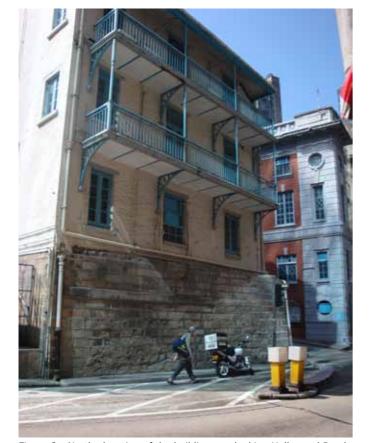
North elevation of the building overlooking Hollywood Road. The ground floor balcony was removed at an unknown date.
